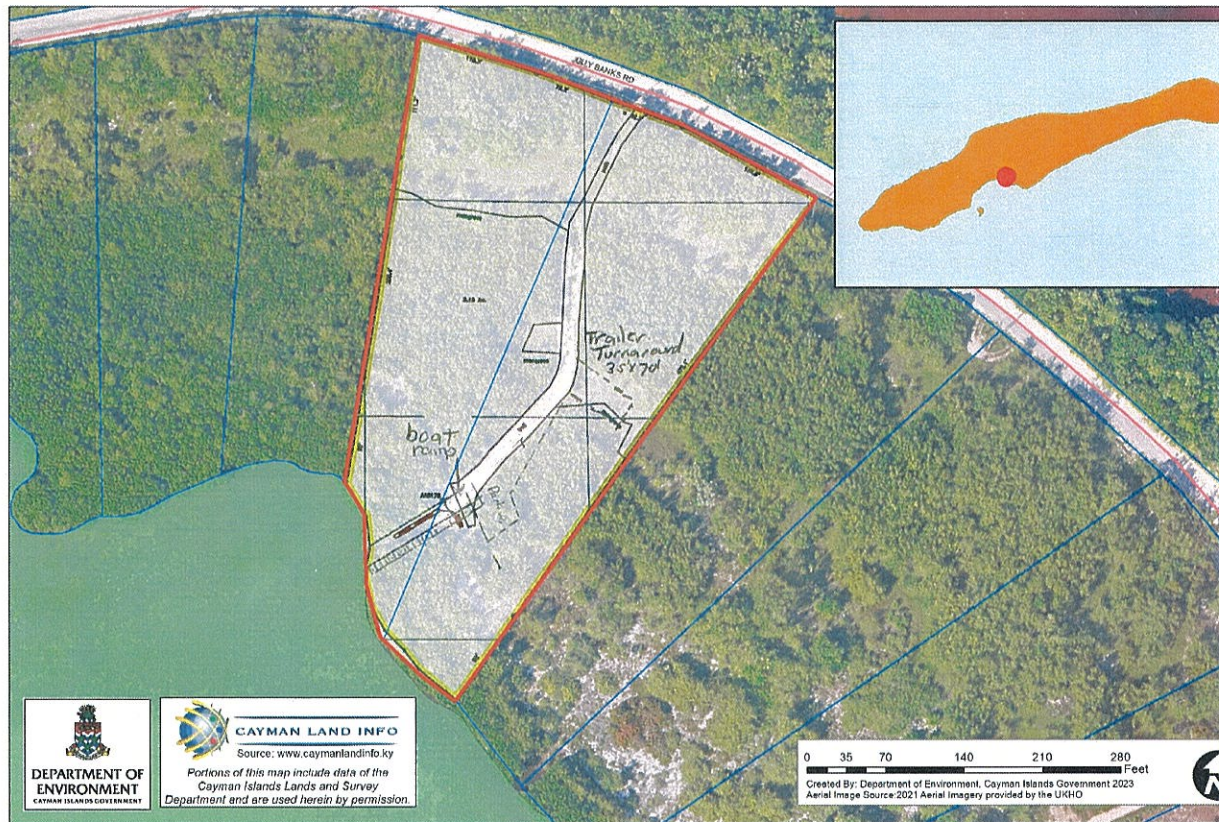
Proposed site plan (Source: Submitted Plans [1/6] / Aerial Imagery Source: UKHO, 2021)
